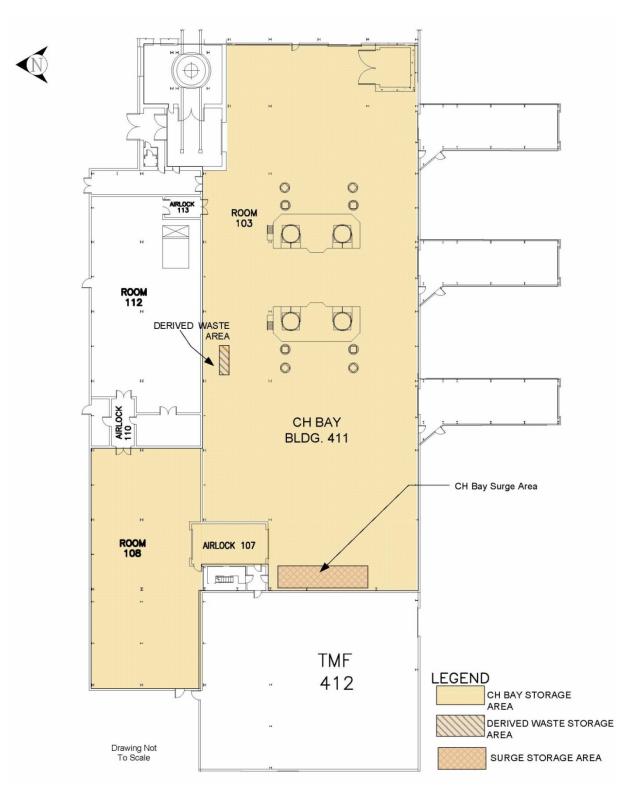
Waste Handling Building - CH TRU Mixed Waste Container Storage and Surge Areas
